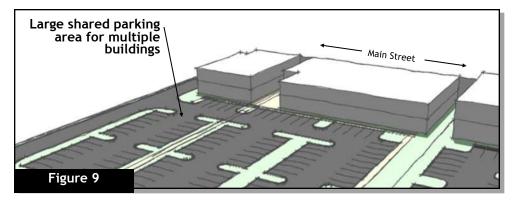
details a rear view of the shared parking complex as part of a larger development project with multiple buildings. The arrangement of the parking area and landscaping elements are covered in Sections D and E, respectively.
